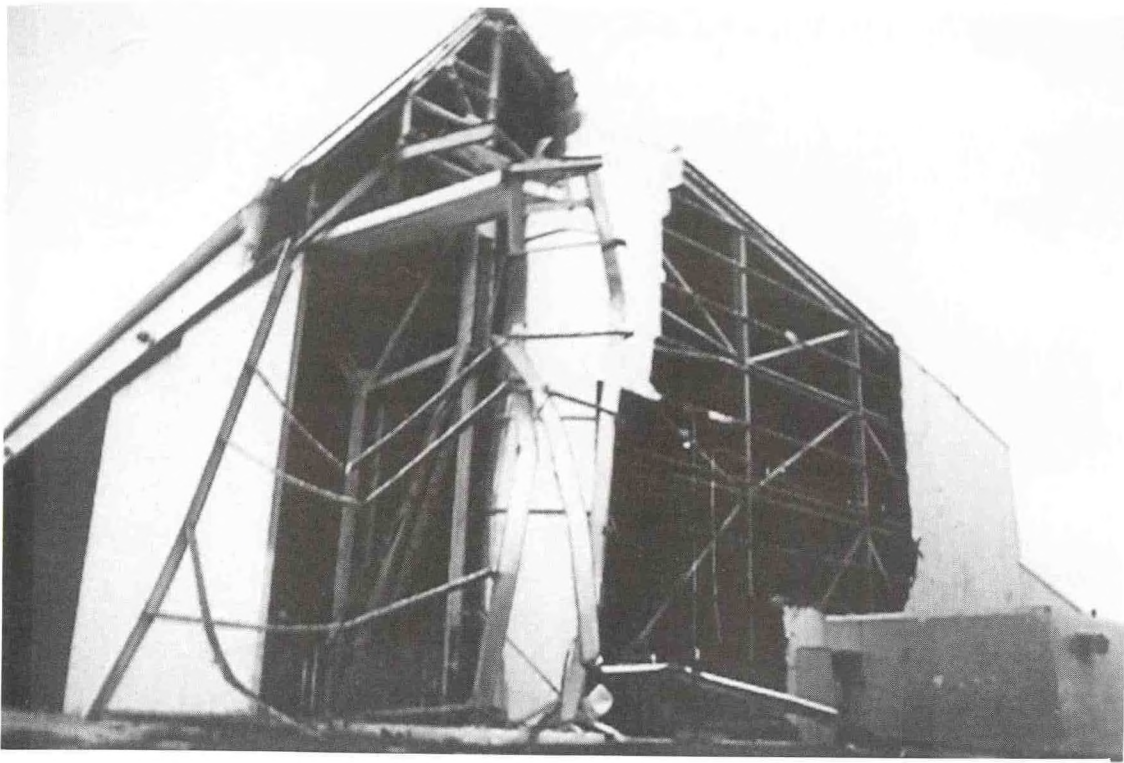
This damaged hangar at Andersen Air Force base is well exposed to the wind and appears to have been damaged when the winds came from the southwest.
